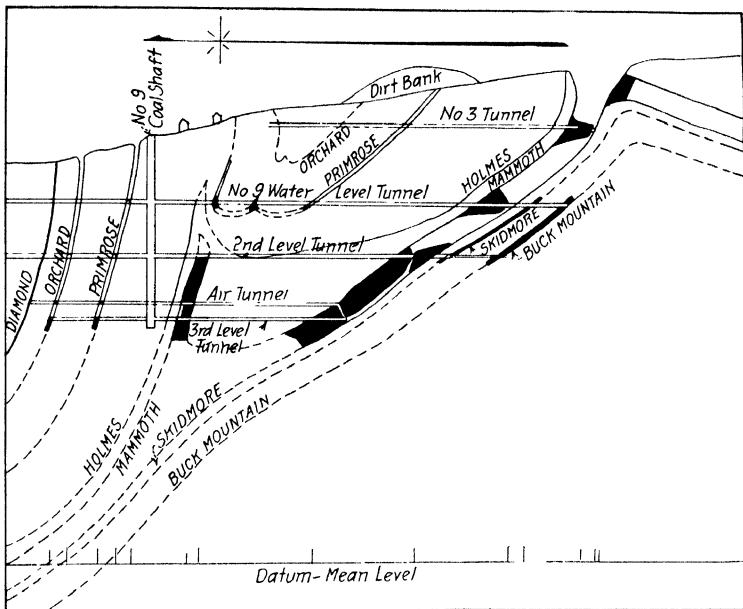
CROSS-SECTION ON LINE OF NO. 9 WATER-LEVEL TUNNEL, COAL DALE COLLIERY.
